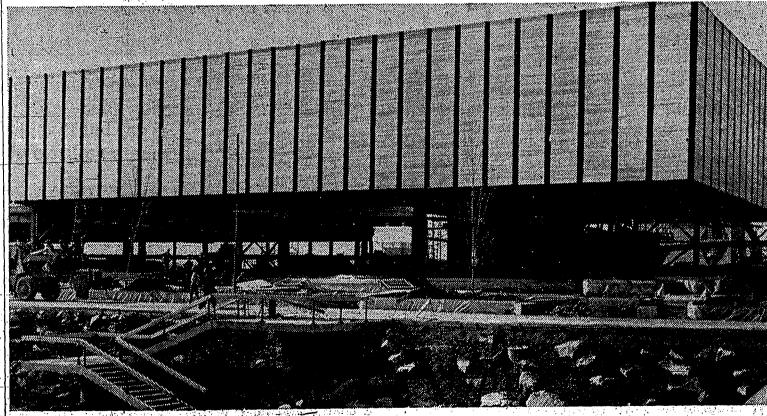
PHOTO SHOWS ONE OF THE TWO MAIN STRUCTURES COMPRISING CZECH PAVIL-
